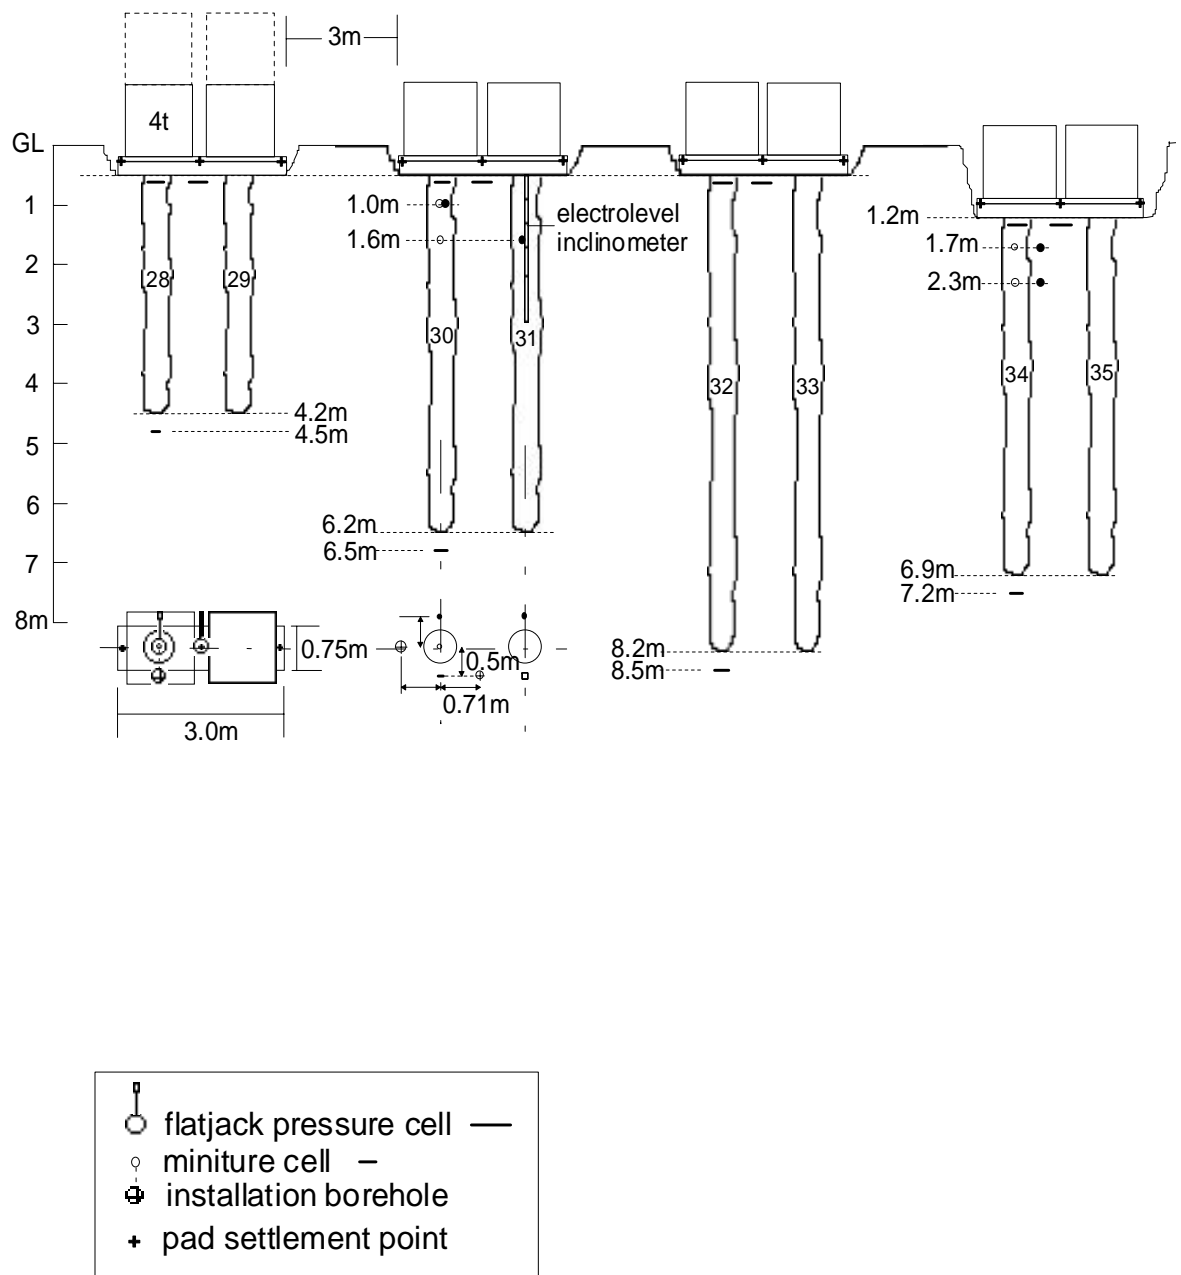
Typical Instrumentation locations associated with trial stone column installation (Bothkennar).
